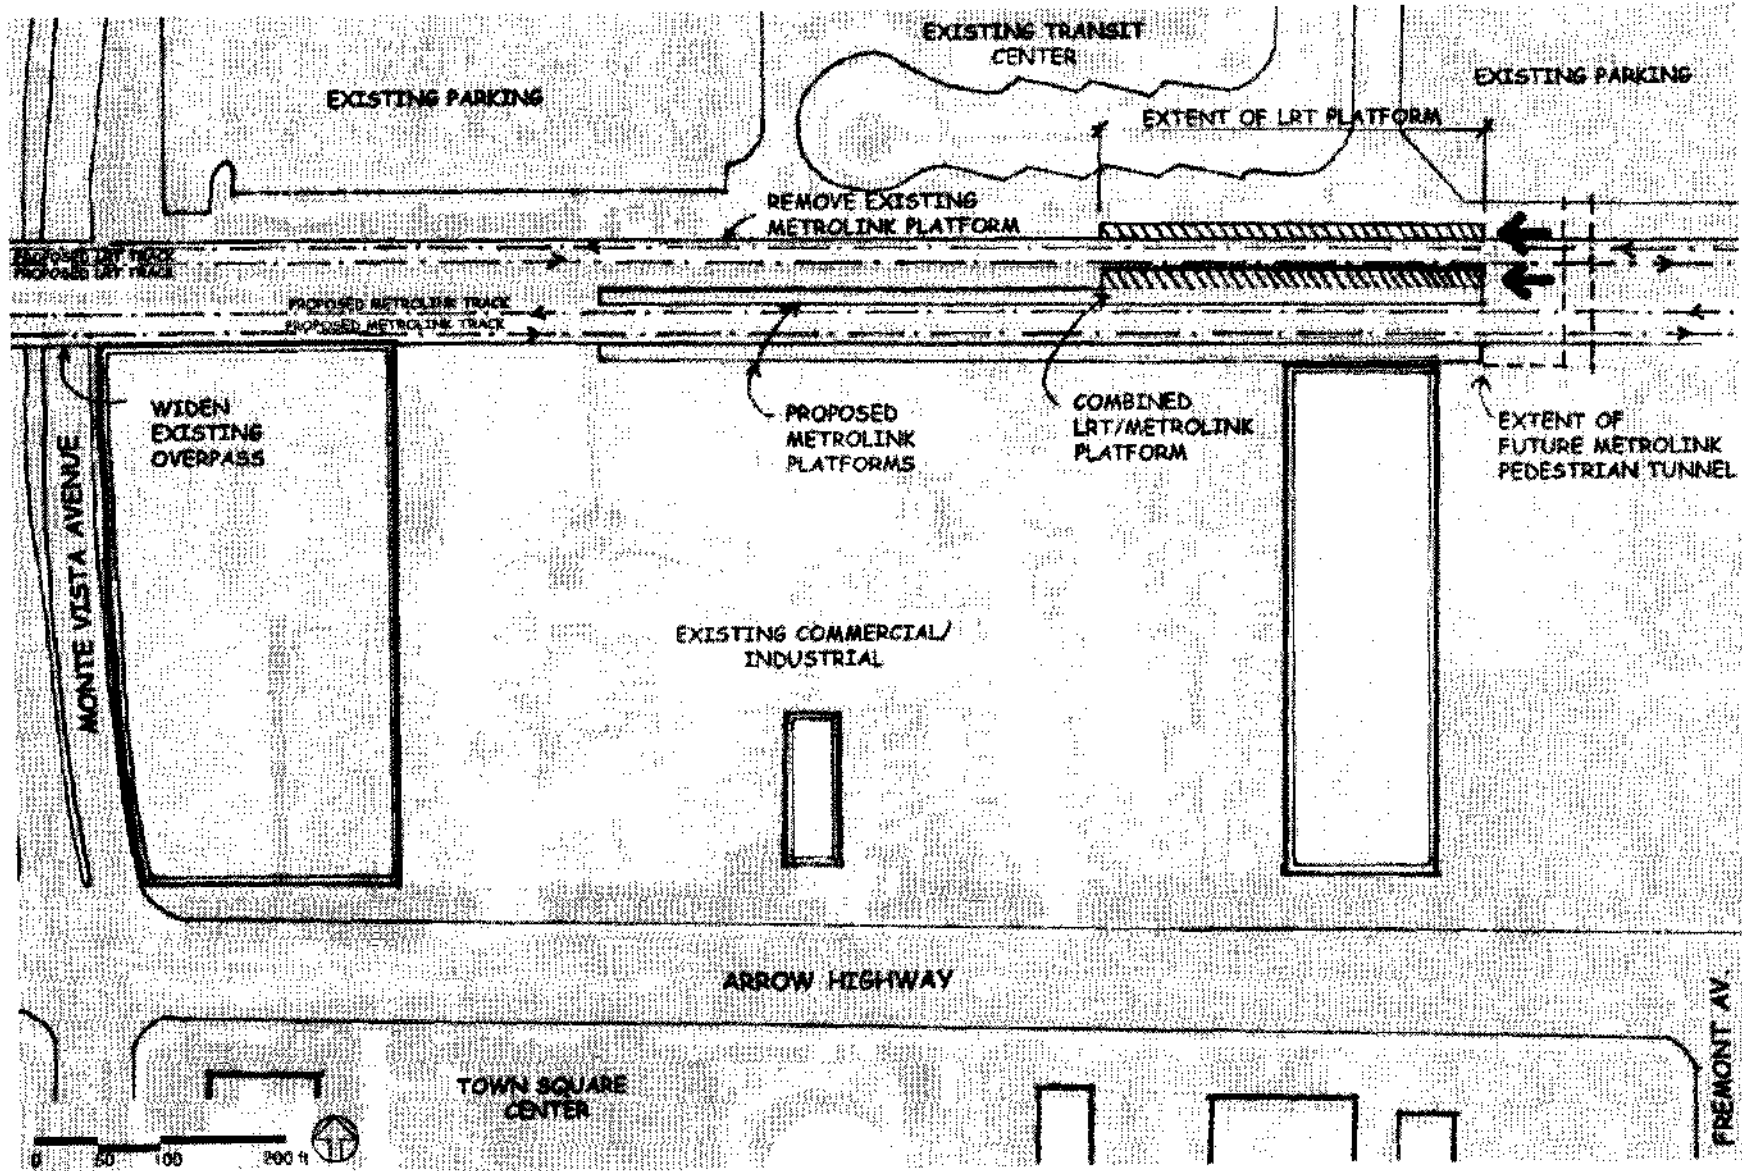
Site Plan: City of Montclair Station, (South), Option G
